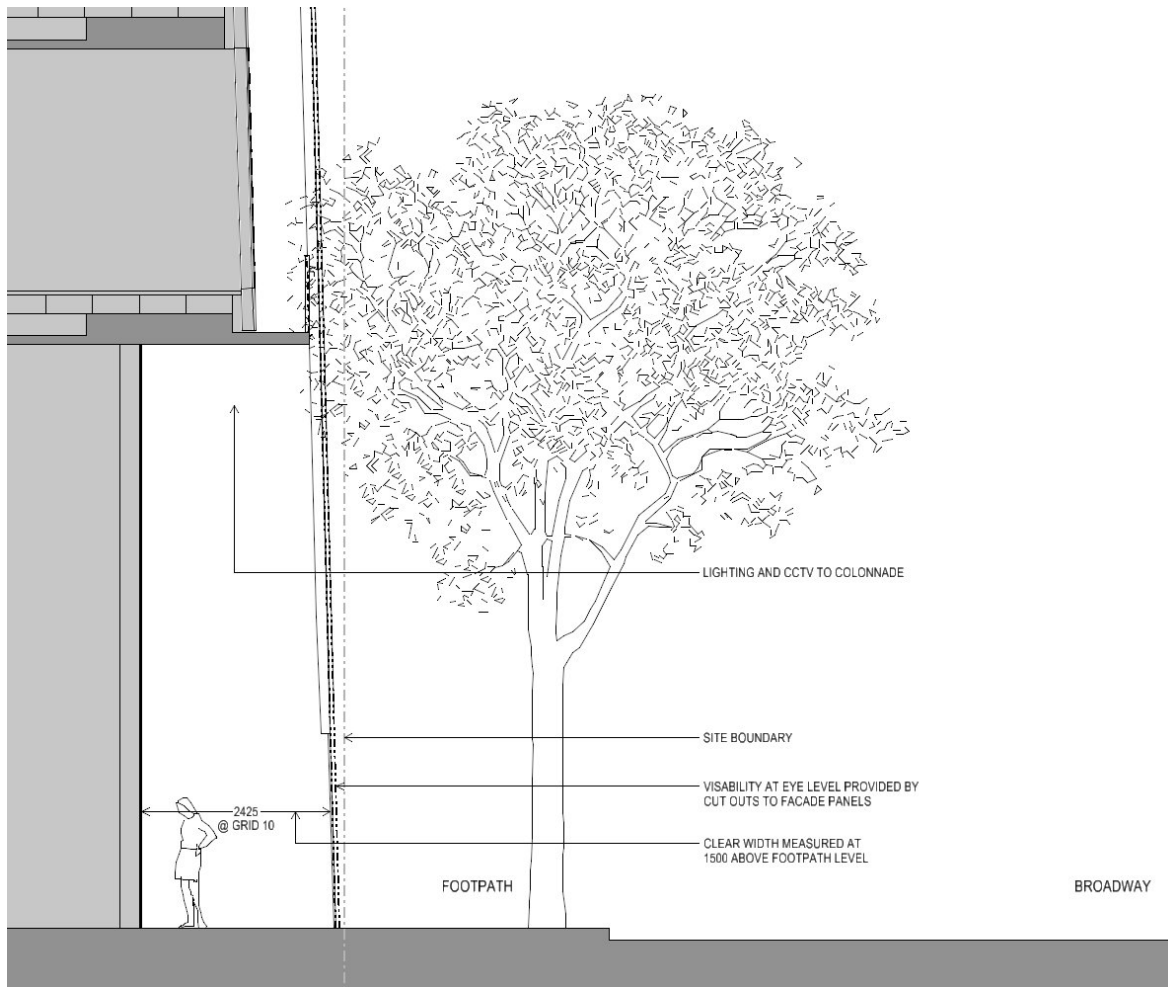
Section of Colonnade along Broadway (Source: DCM)
